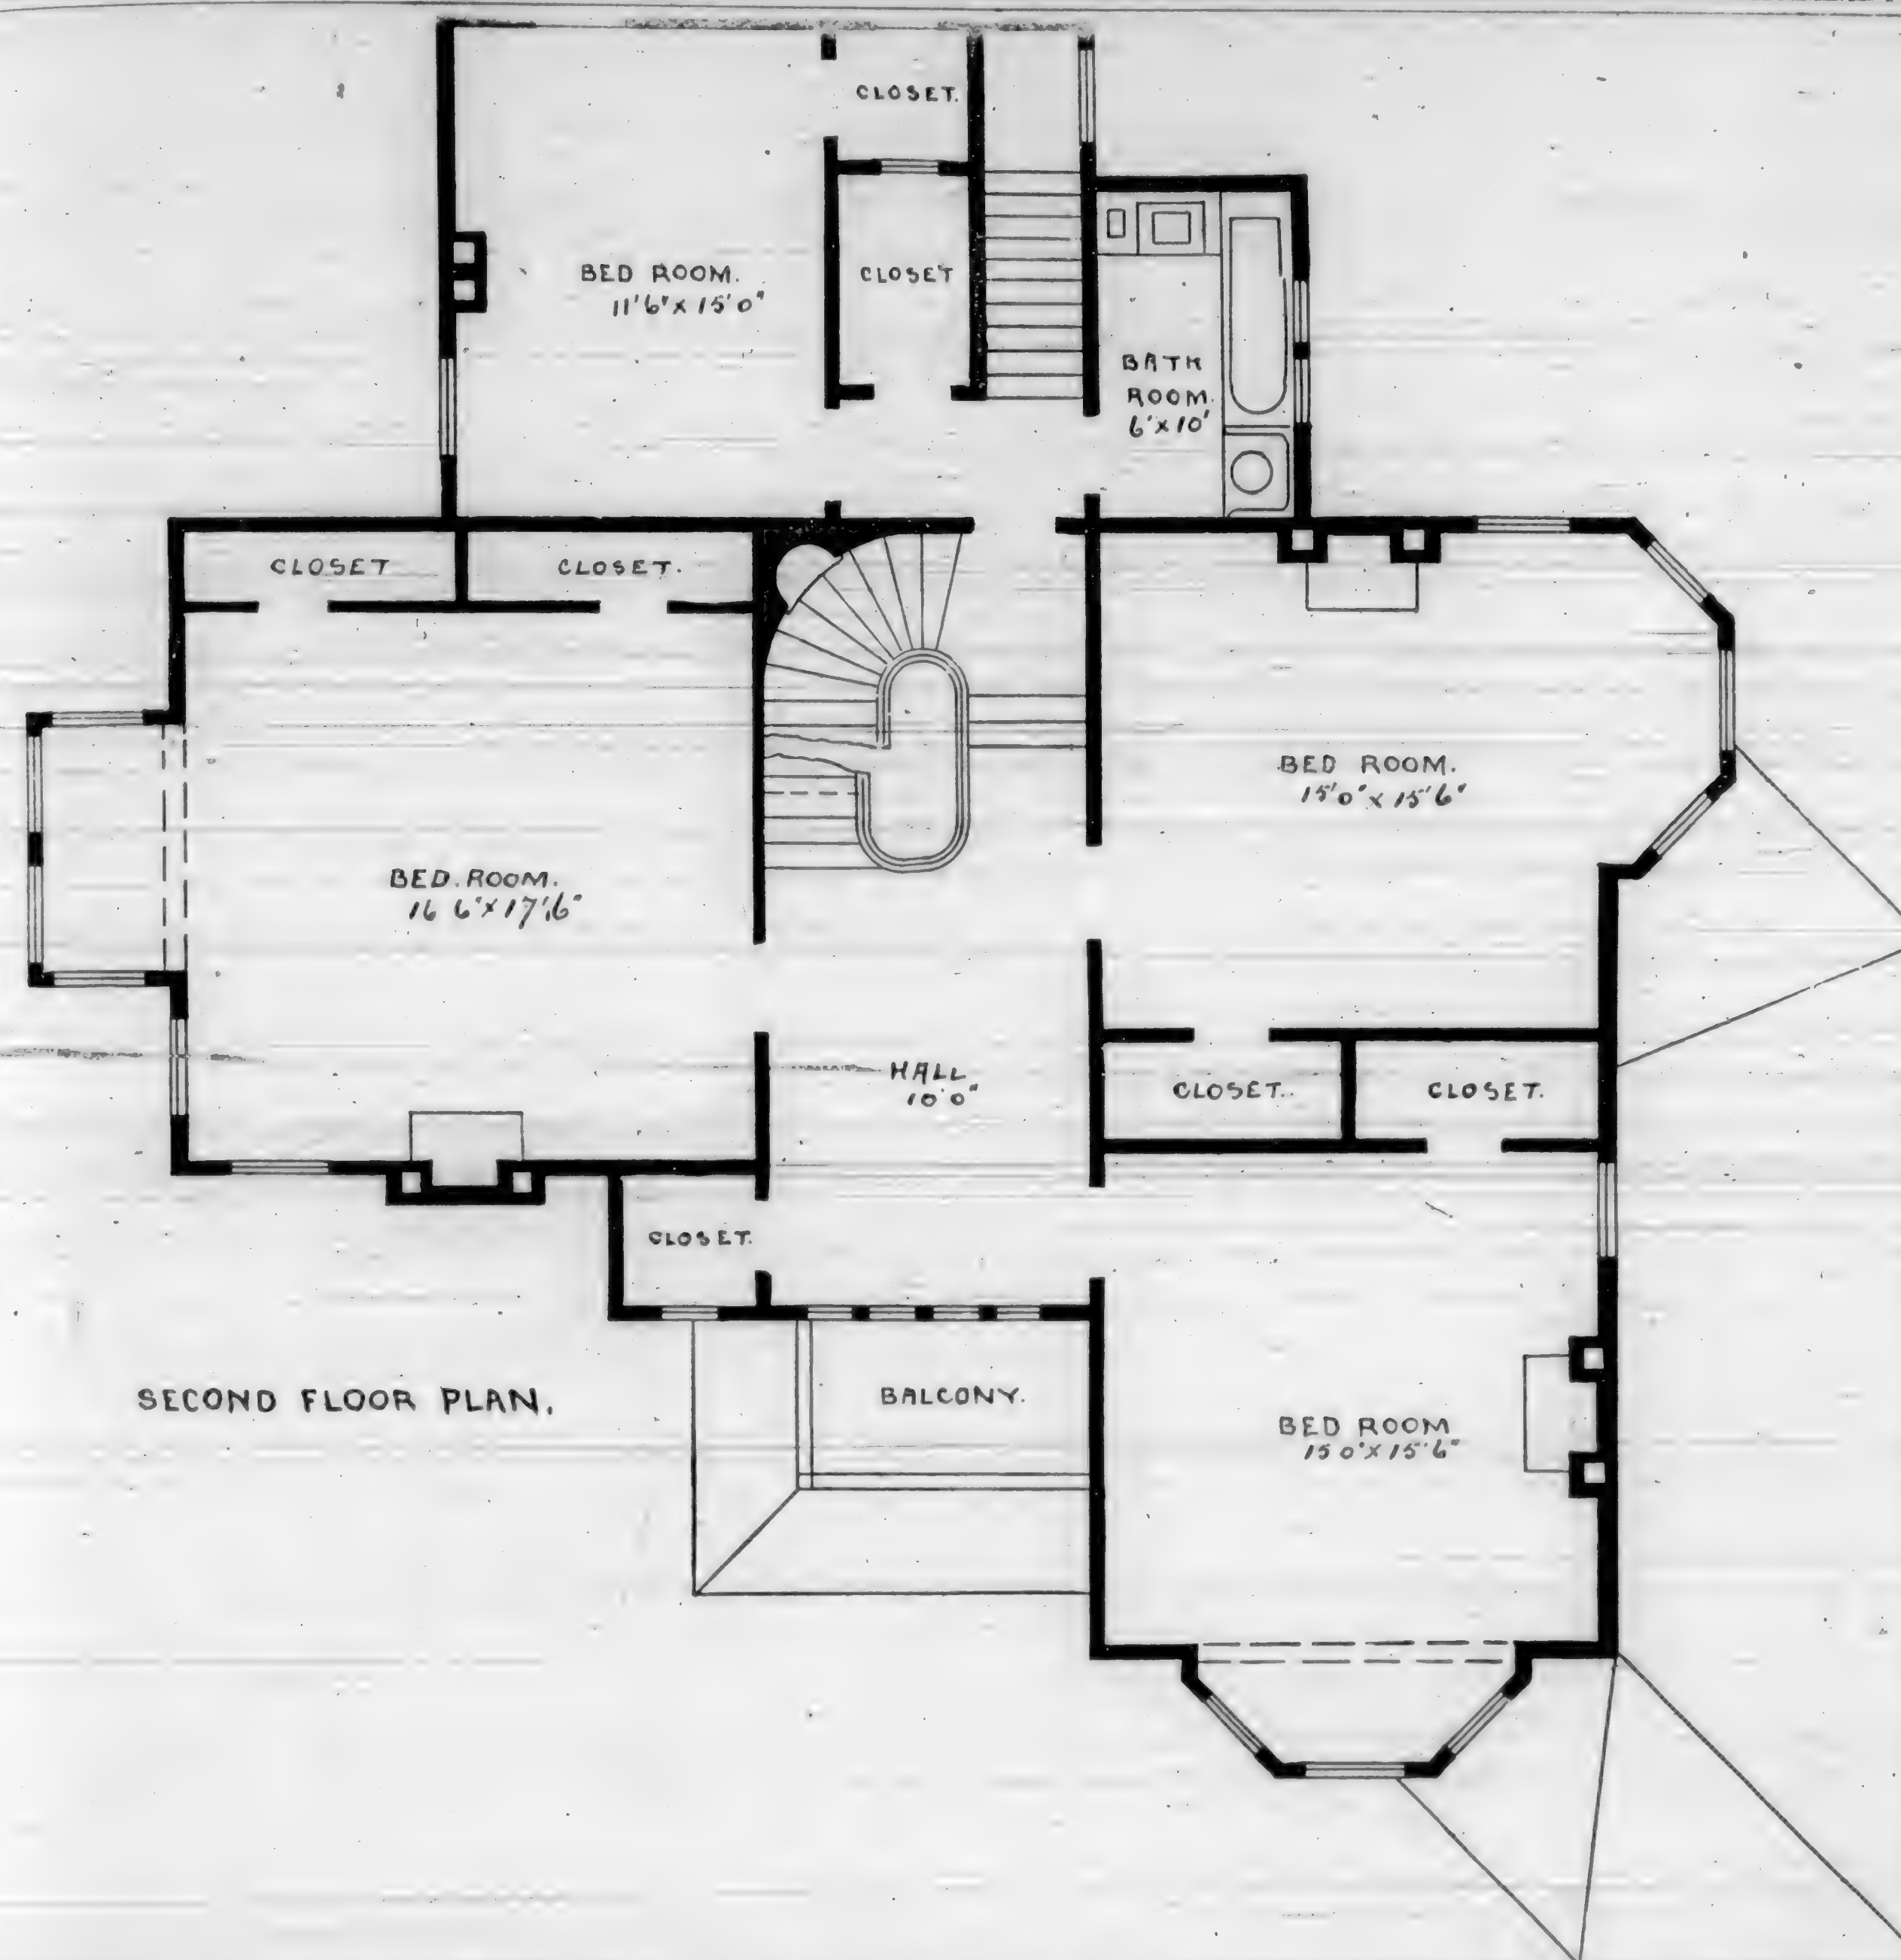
SECOND FLOOR PLAN OF COUNTRY DWELLING.
